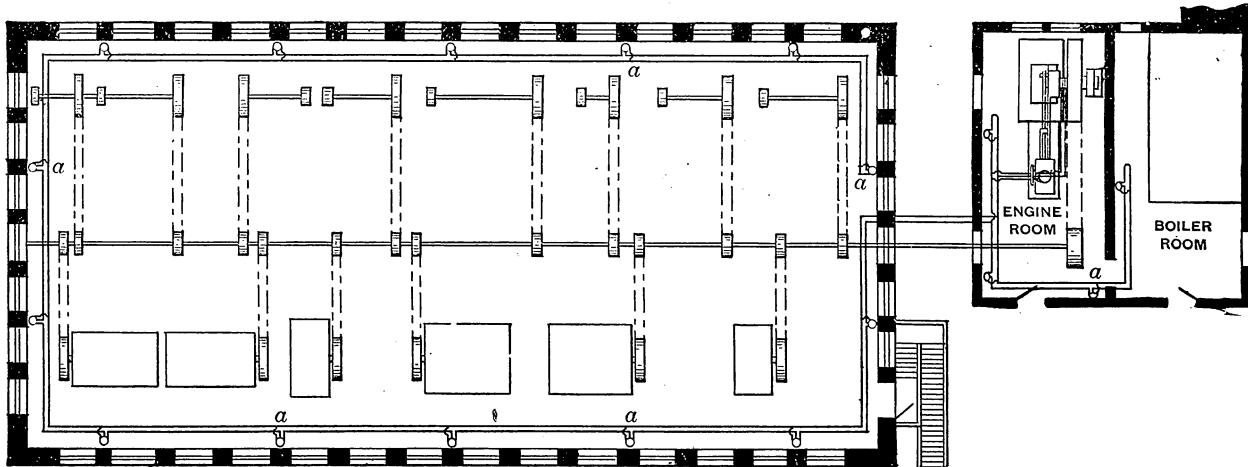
Plan View, Showing Method of Wiring Factory.
